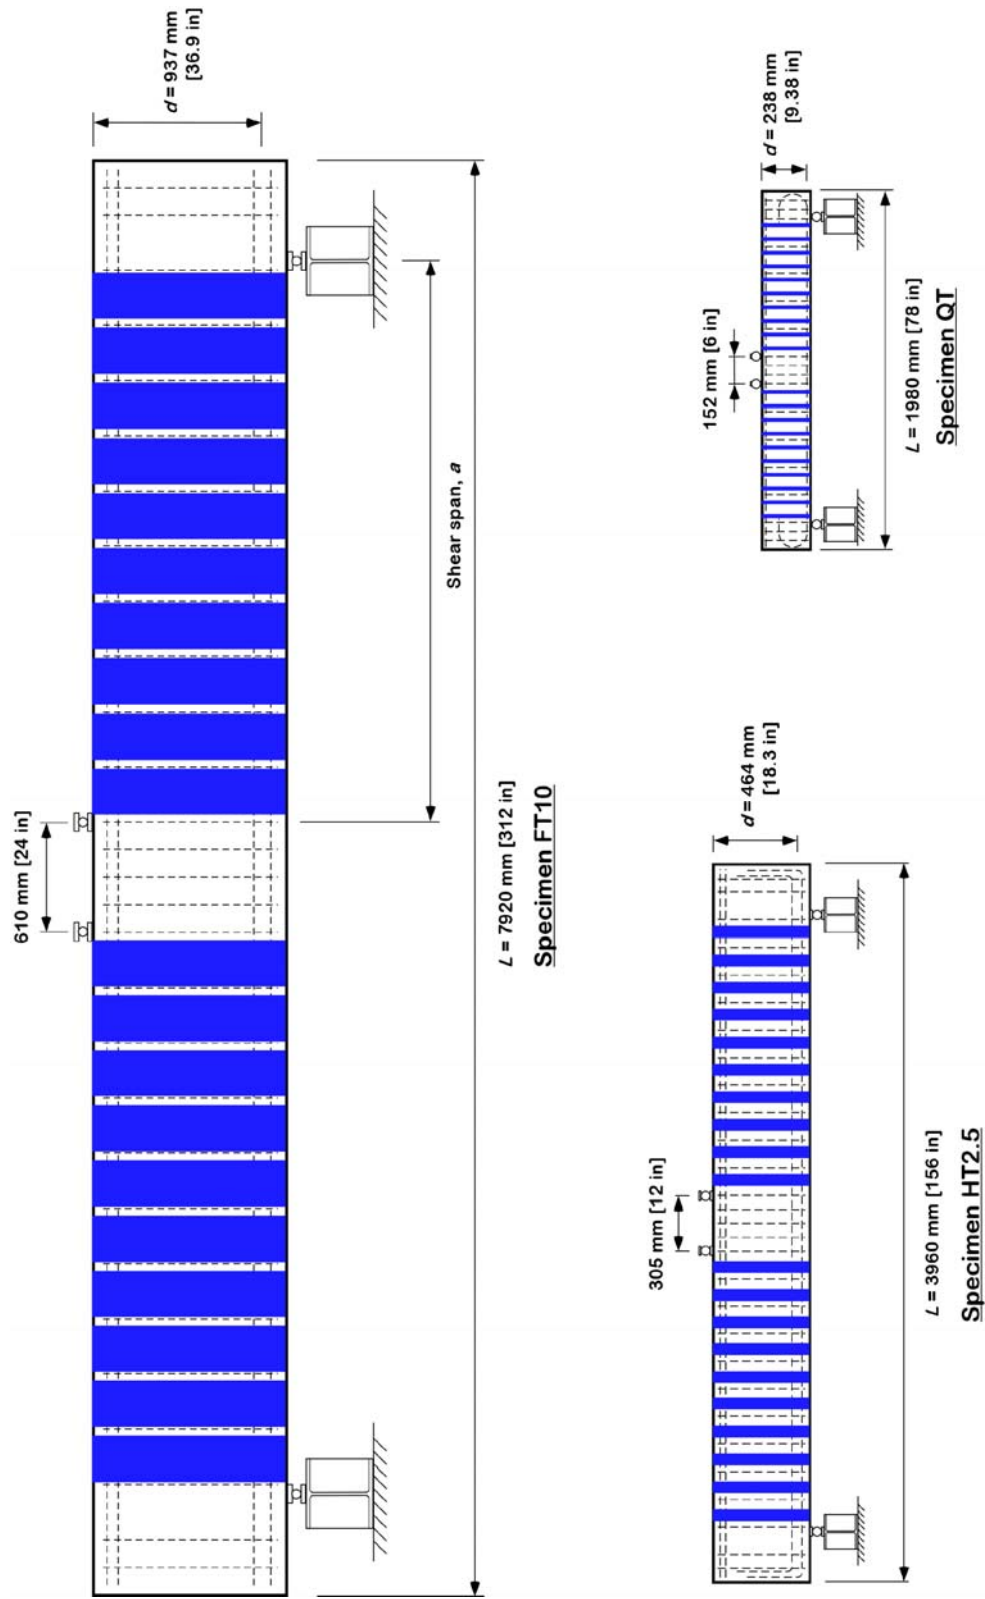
Elevation views of specimens FT10, HT2.5 and QT.
